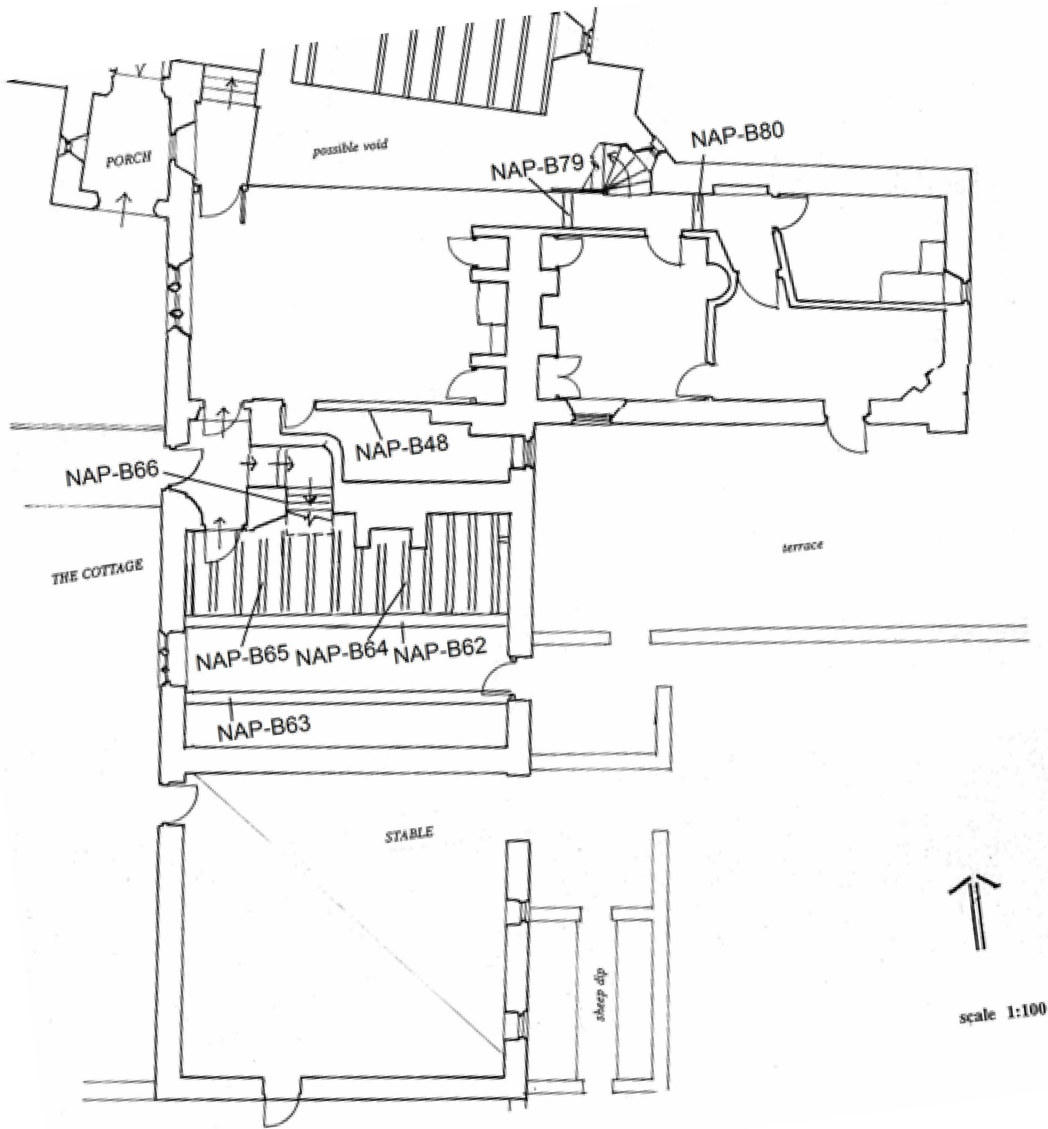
Service range and east wing, ground-floor plan showing the location of samples NAP-B48, NAP-B62-6, and NAP-B79-80 (John Warren)
